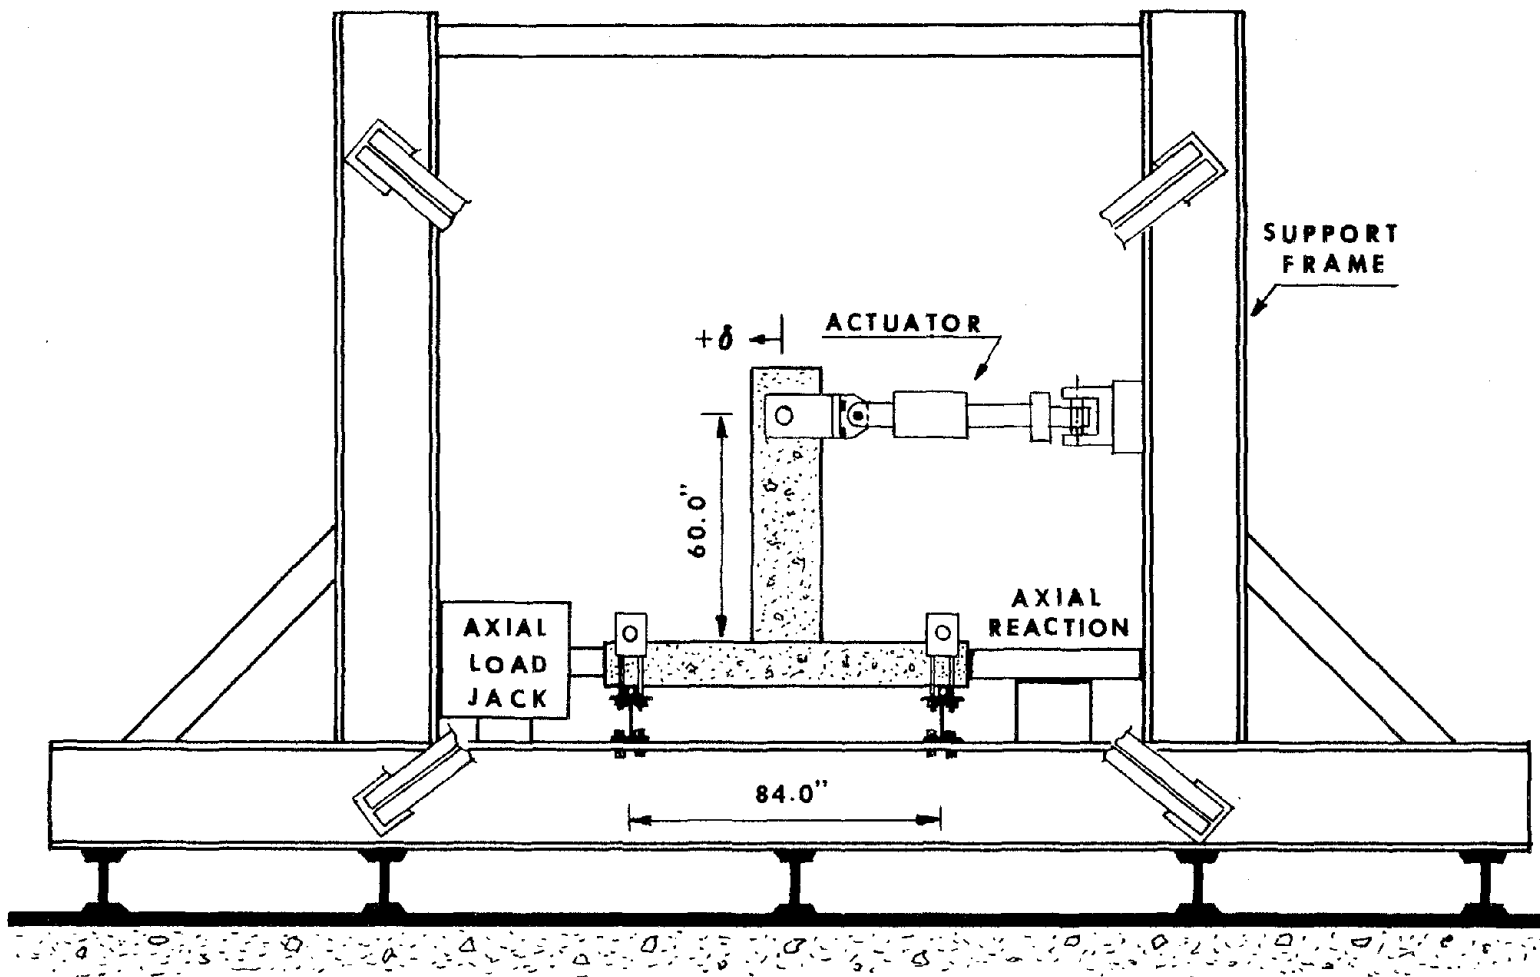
Testing Frame 1, Used for Specimens 1 through 4.
